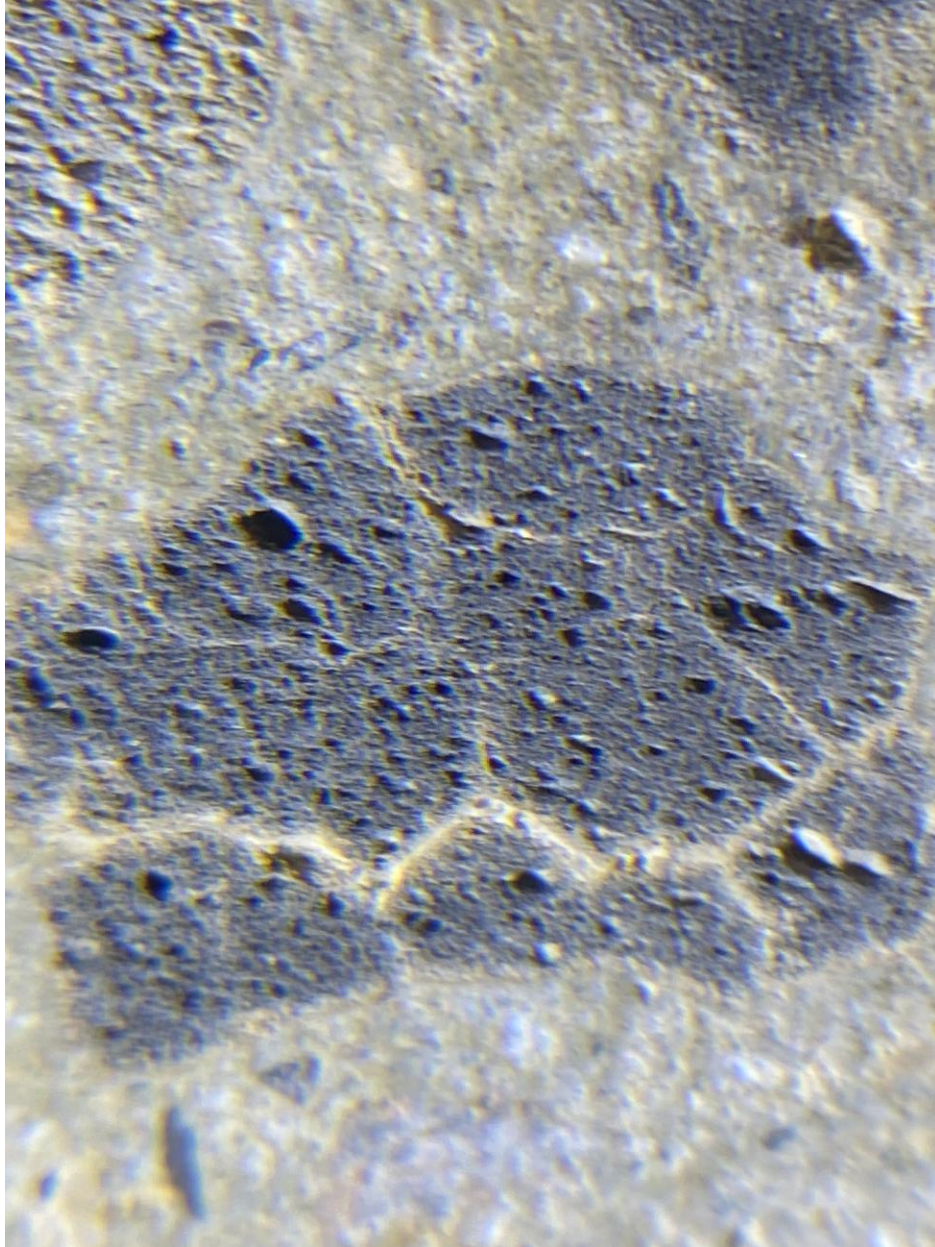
Aggregate in core 4 of lightweight concrete deck at bridge F-792 (2).
